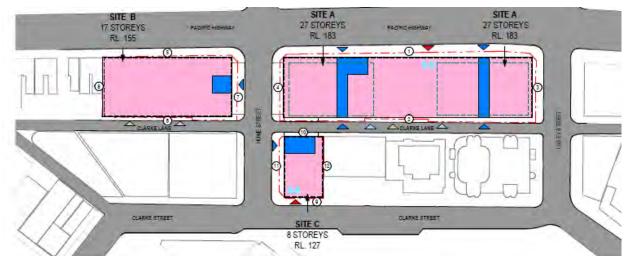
Proposed location of buildings on the Crows Nest OSD site.
